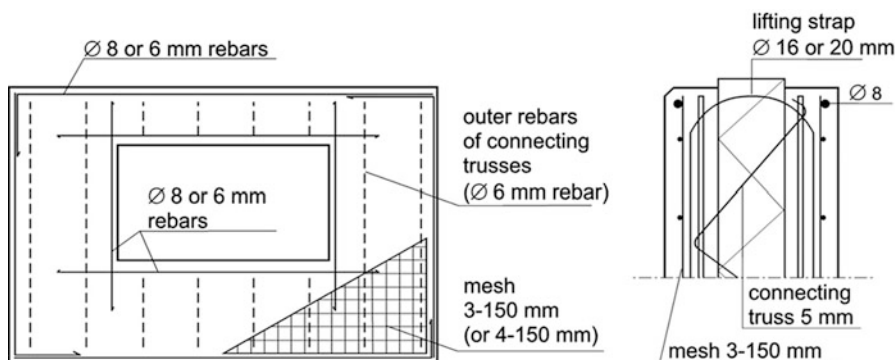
Typical reinforcement of outer layer of a concrete facade panel (Pentti et al. 1998)
